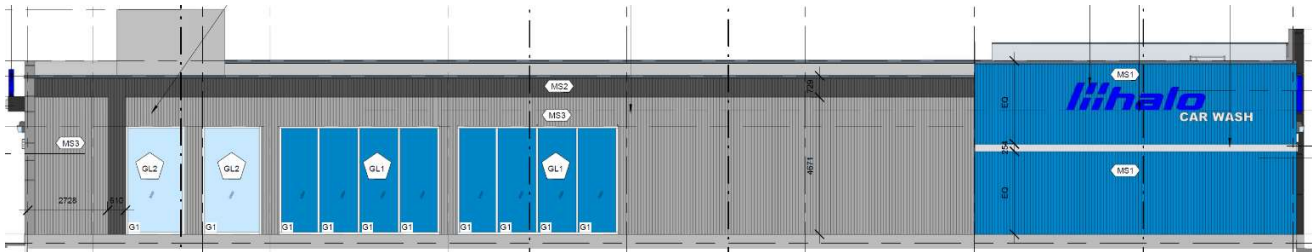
Exhibit O: South Elevation of the Building showing the varied colour palette, the vertical and horizontal projections and plentiful glazing
